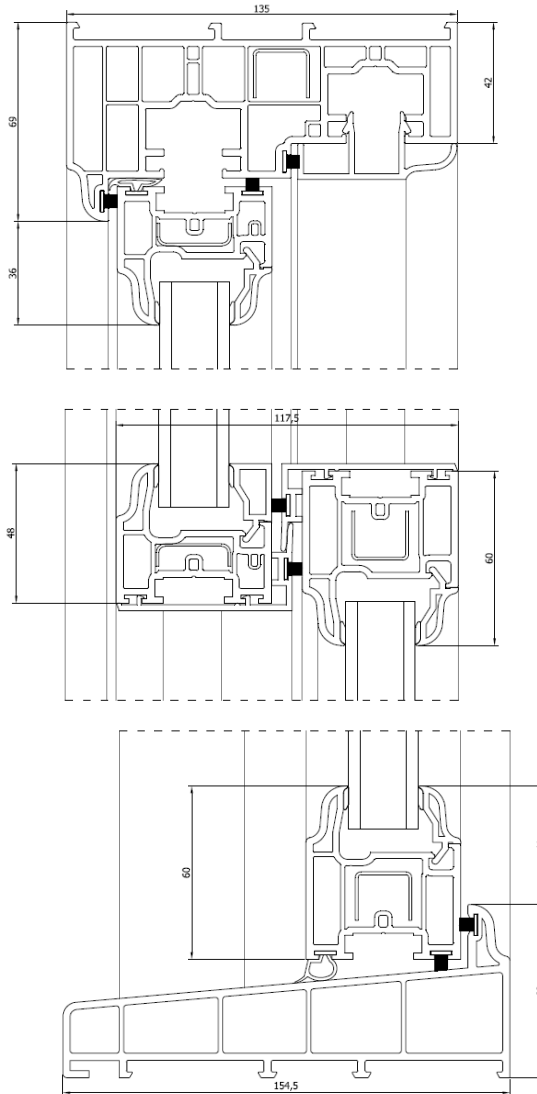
Sections through an acceptable uPVC Double Glazed Replacement Window
